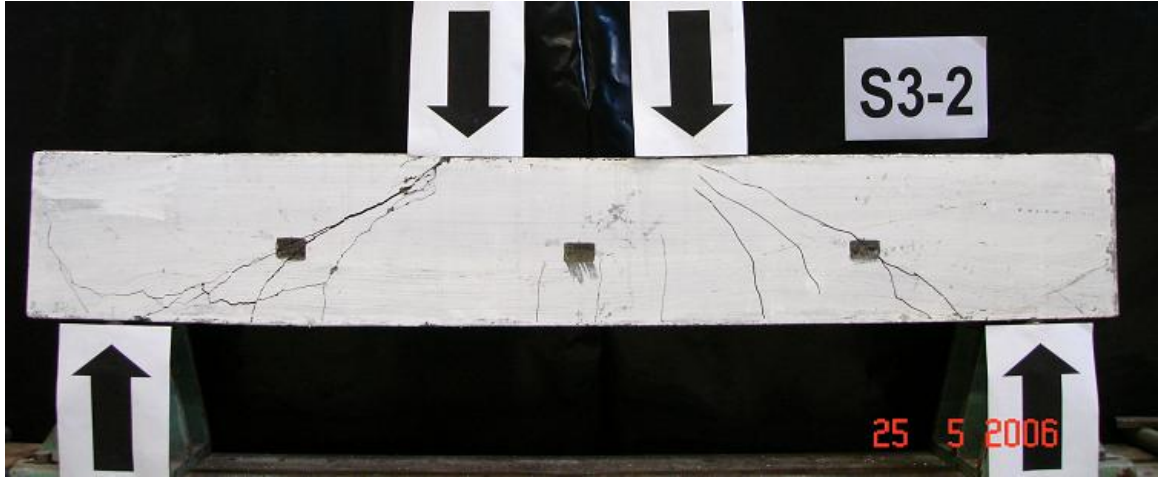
Overall Crack Pattern for Beam 3-2 (Front Face)
